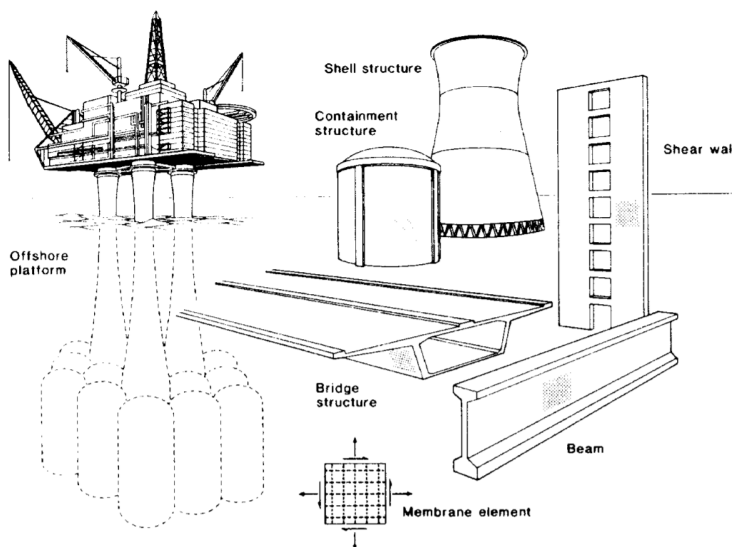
Structures with load primarily carried as in-plane stresses (Vecchio & Collins 1986)
